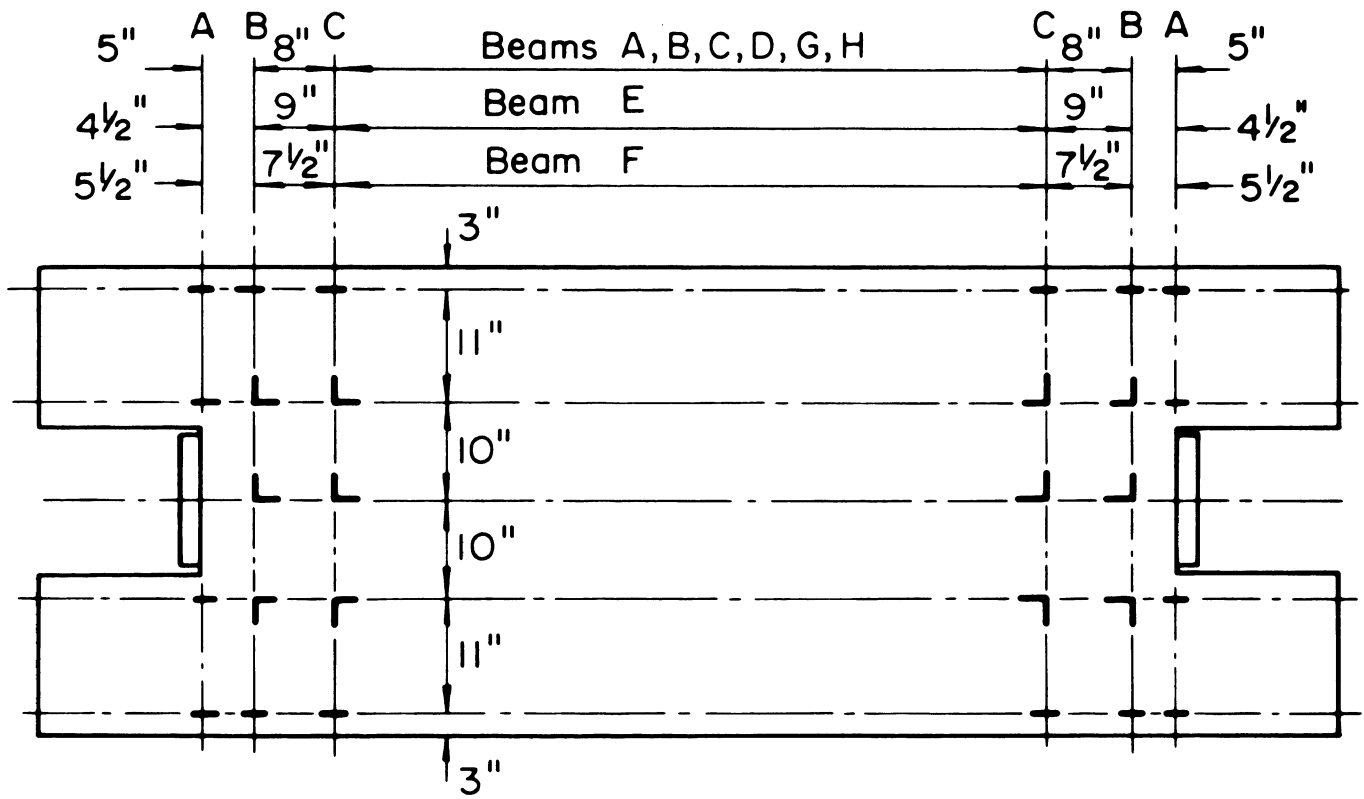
Location of Electrical Resistance Strain Gages on Concrete Slab
